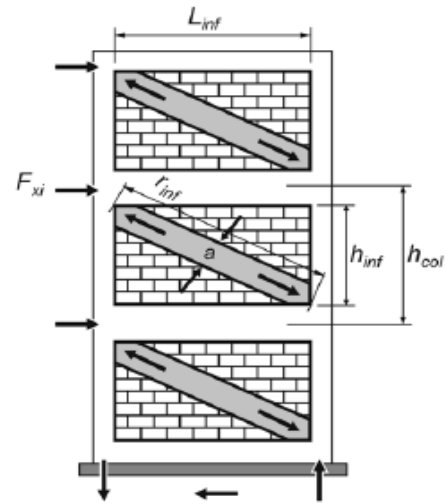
Masonry infill walls as single equivalent diagonal strut.
